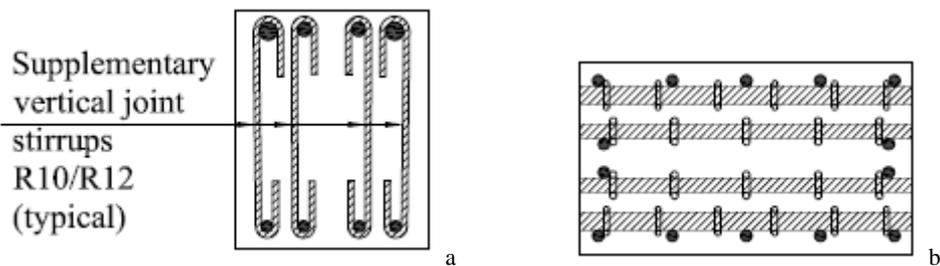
Supplementary vertical joint stirrups layout. (a) Beam section; (b) Column section.
